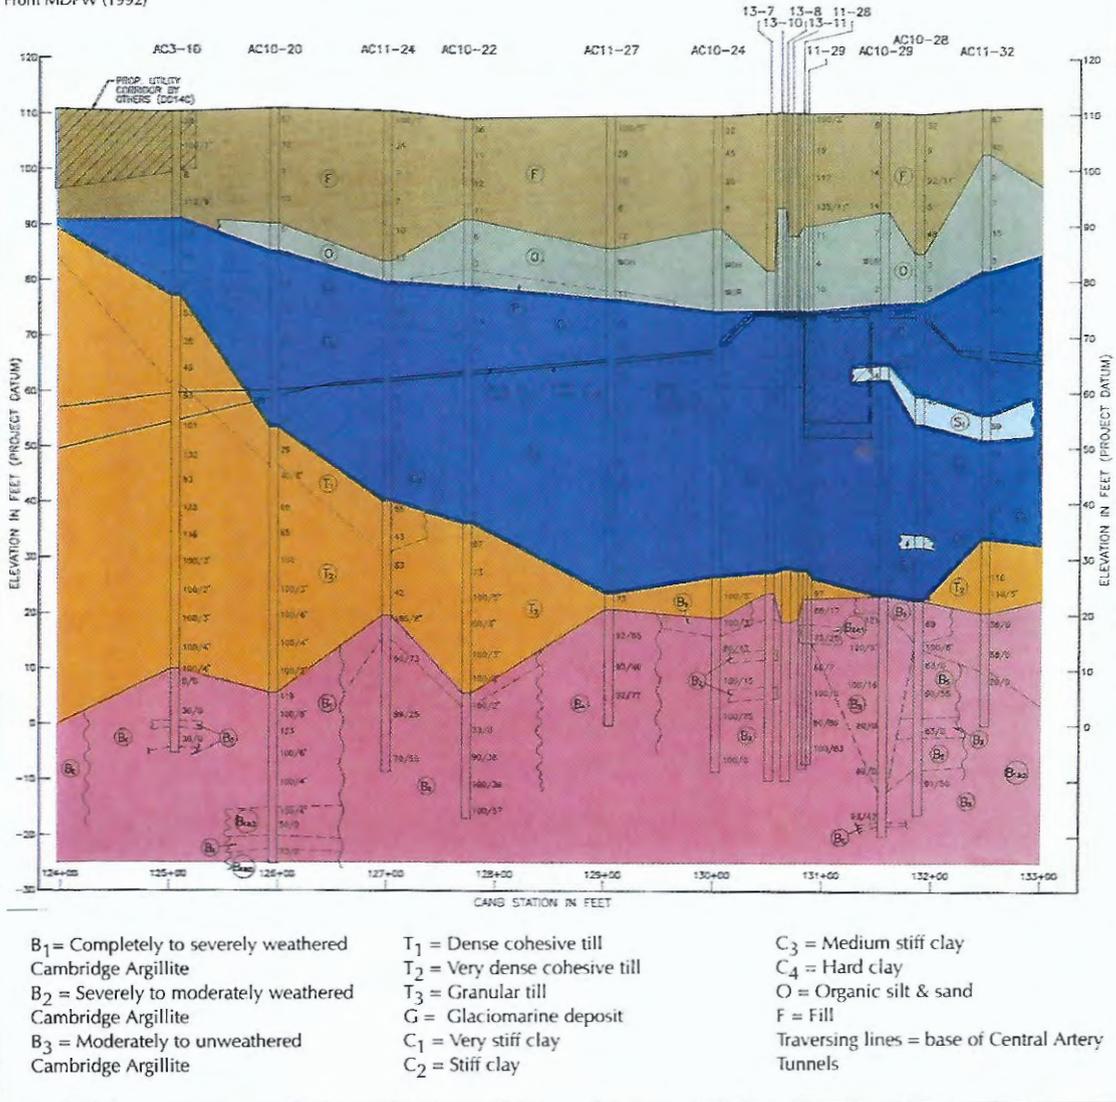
Section along the Central Artery Tunnel from Congress Street to Fleet Center near the Charles River, middle slurry wall between Stations 124+00 and 133+00 (view west to southwest).
